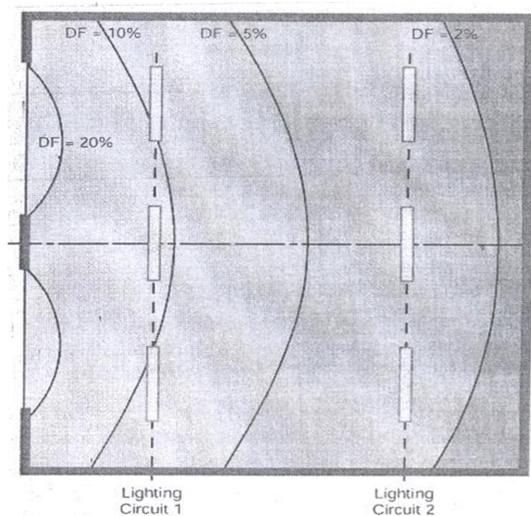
Room Plan showing window positions and example daylight factor(DF) contours. Also ceiling-mounted luminaires and electric lighting circuits [Actionenergy, 2003]
